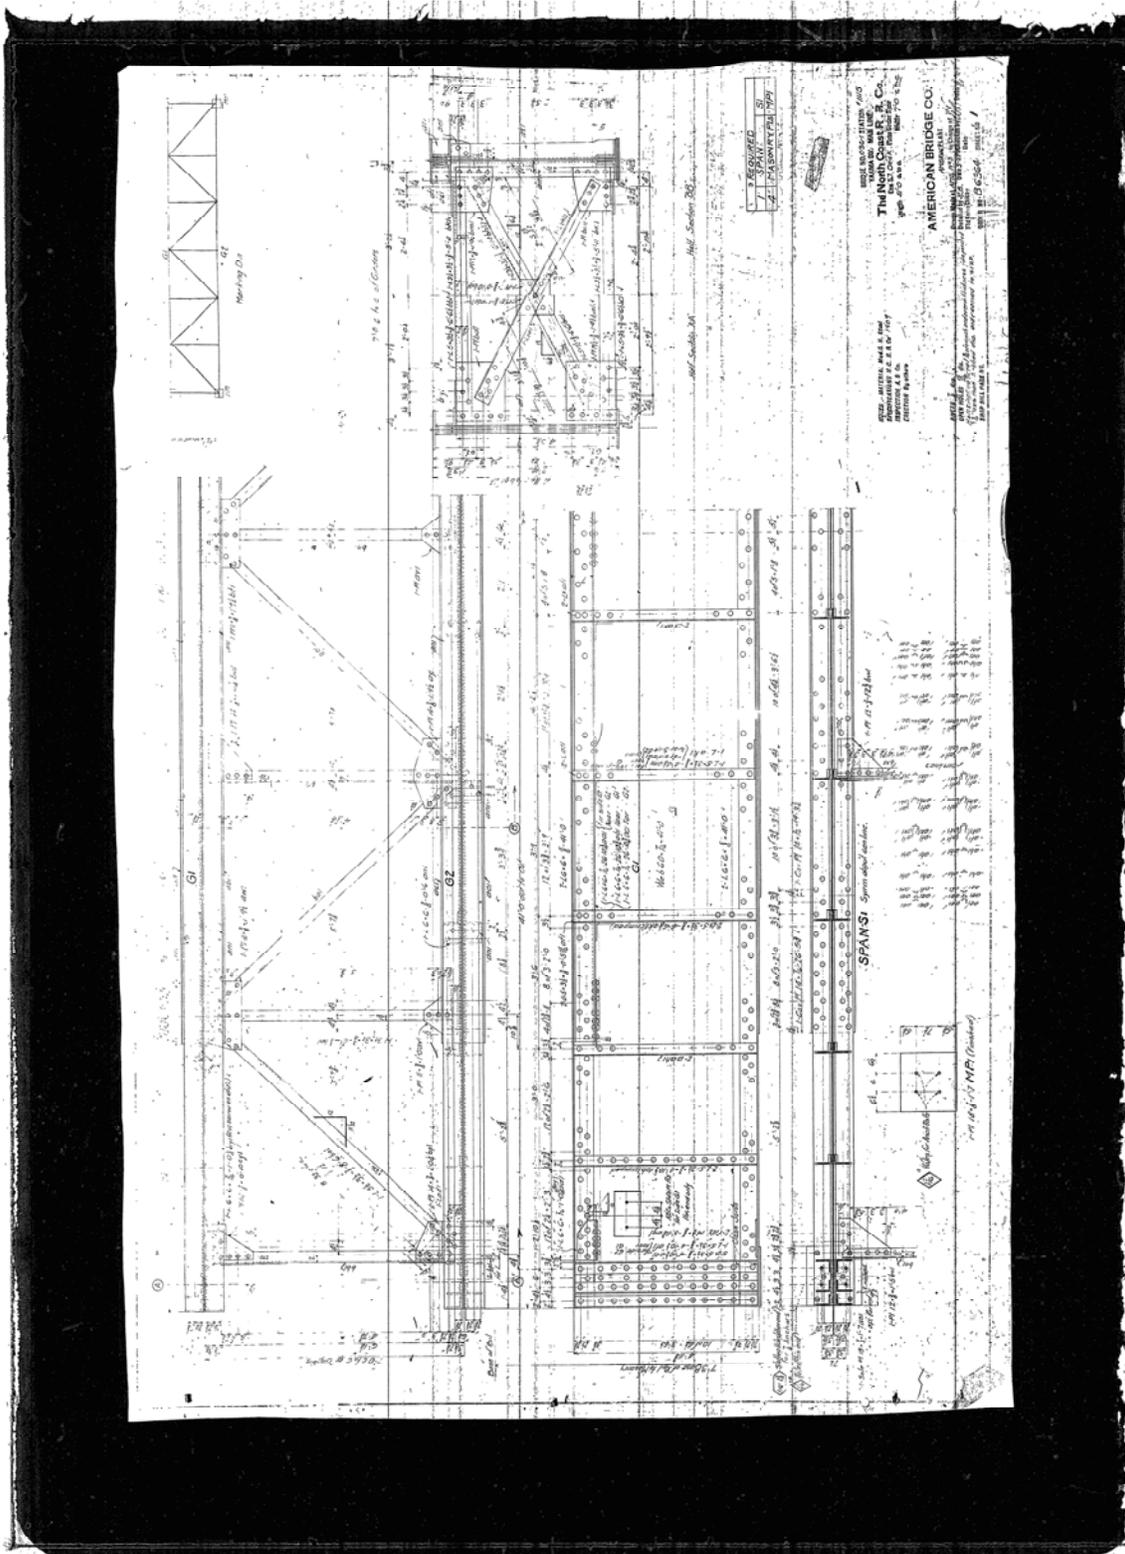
1910 drawing of North Coast Railroad Company Bridge by American Bridge Company
